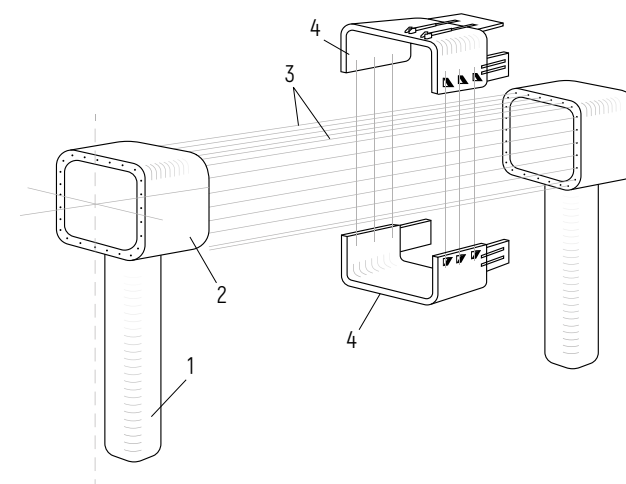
Installation of a concrete paver to perform the technological process of concreting the span of the GPV overpass:
